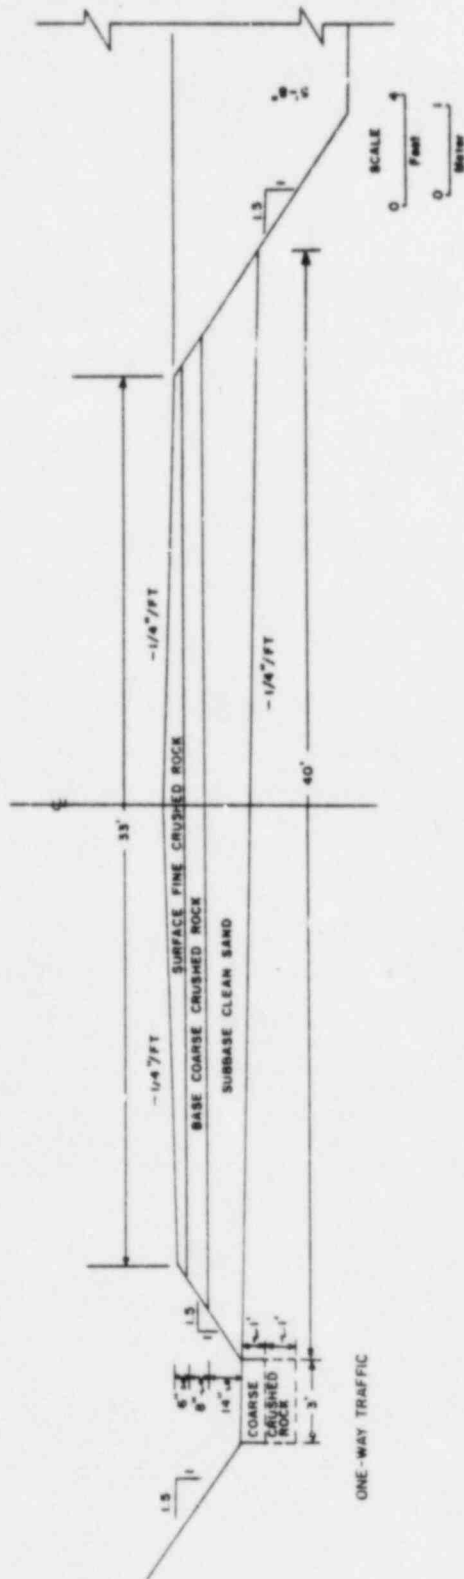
Construction design of haul roads. Source: ER, rev. 1, Fig. 3.4-1.
